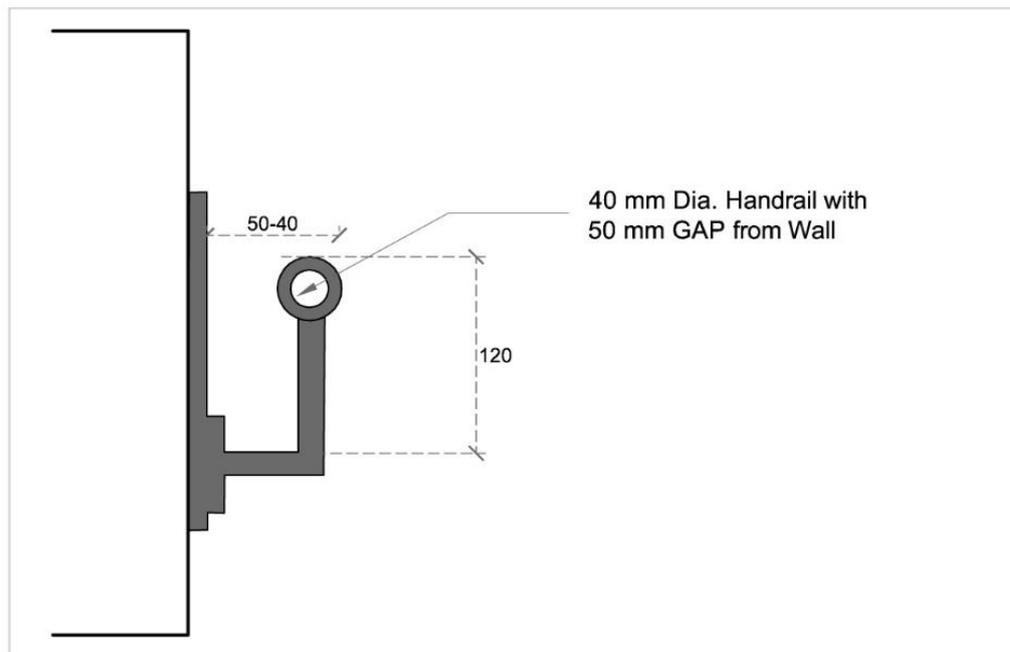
Fixing Detail of Handrail to the Wall
